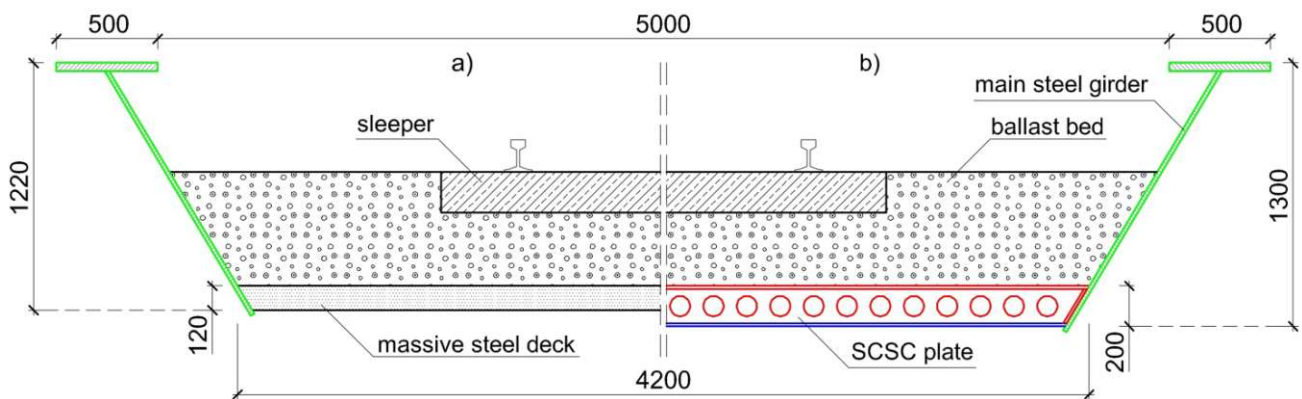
Regular trough bridge section for a structure with a span of 16 m, comparison of two deck systems: a) massive steel deck slab; b) SCSC plate. Dimensions in [mm]
